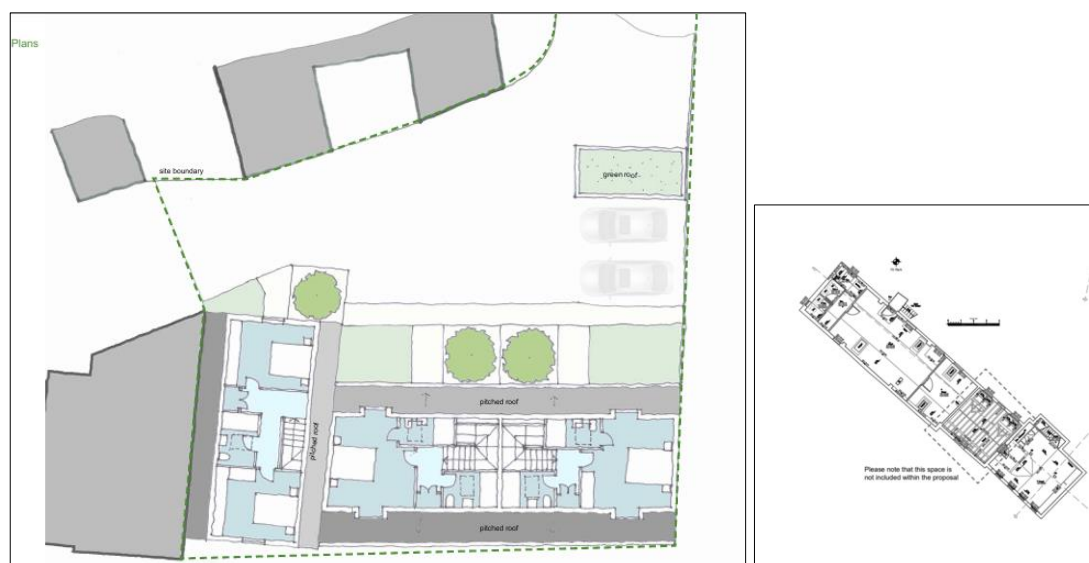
Proposed First floor plan (with inset showing existing first floor plan)
